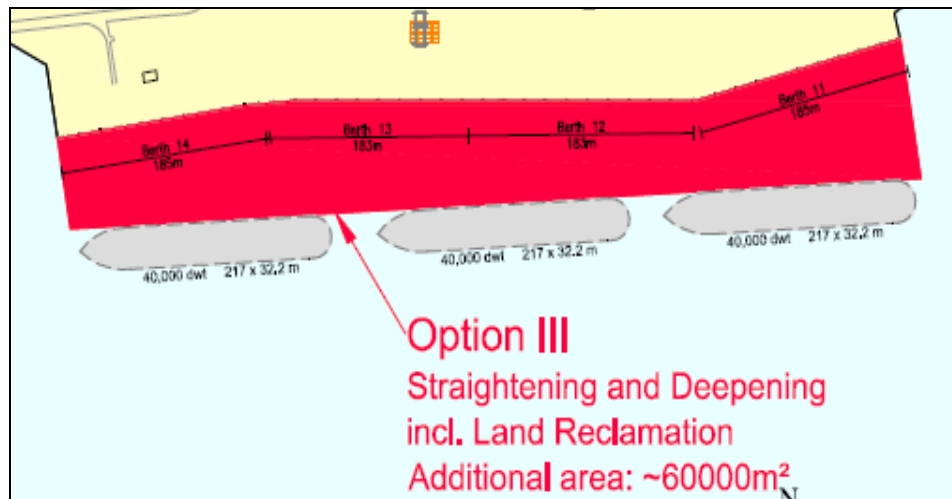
Proposed works at berths 11-14 indicating dredging and land reclamation areas
